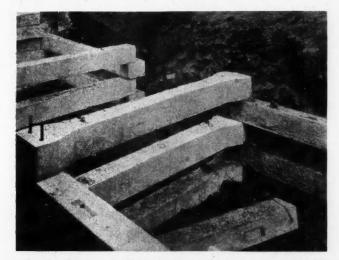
Concrete Cribbing Units Are Cast Like Fence Posts. Iron Dowels Loose Fitting Into Holes Lock the Ends in Place When in Use.
